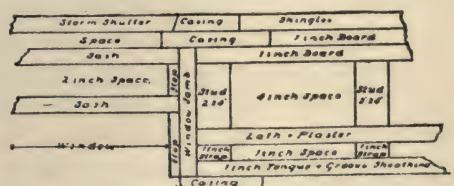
SECTION THROUGH WALL AND WINDOW.
